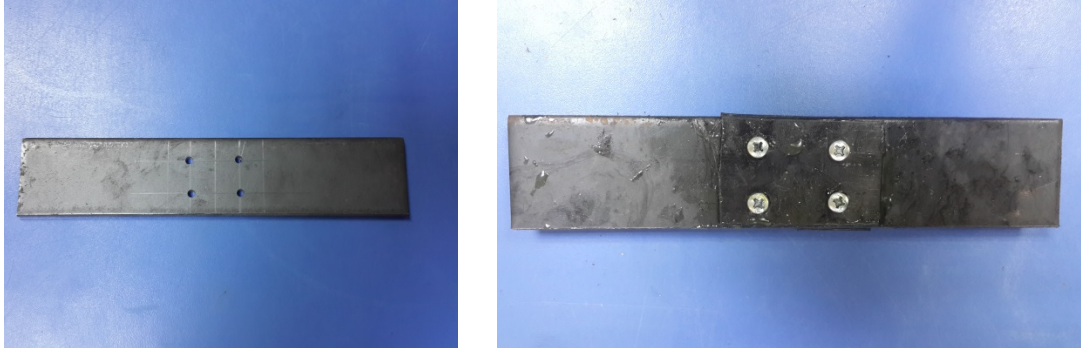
Drilled holes in steel plate and CFRP and bolt anchorage.
